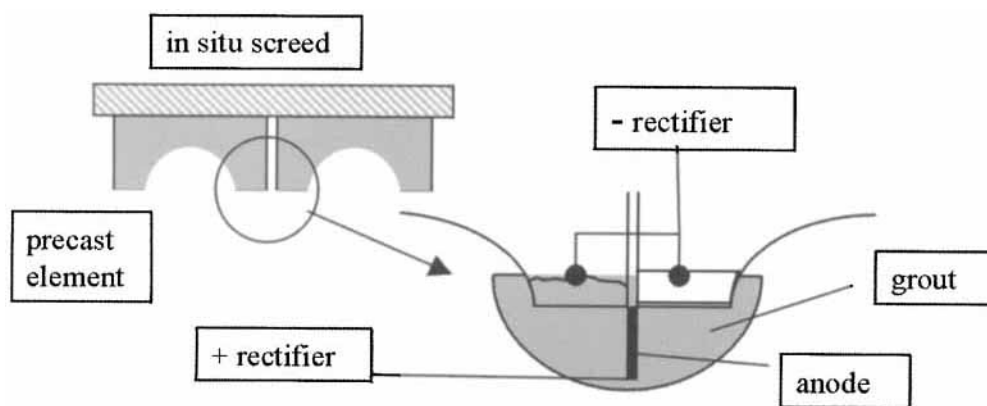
Schematic cross-section of cathodic protection for precast ground floor elements.
